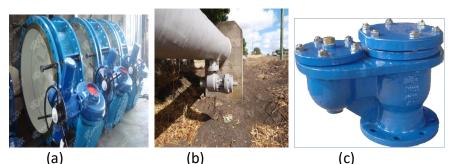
Examples of valves: a) large butterfly valve b) scours valve) c) air valves.
